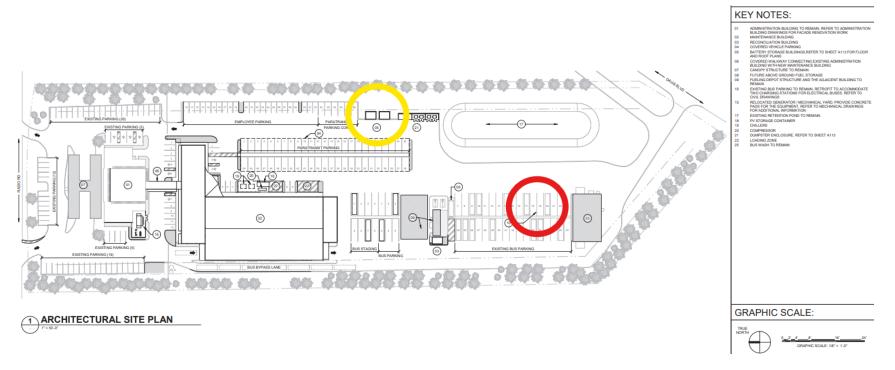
SITE PLAN FOR CAT OPERATIONS FACLITY
